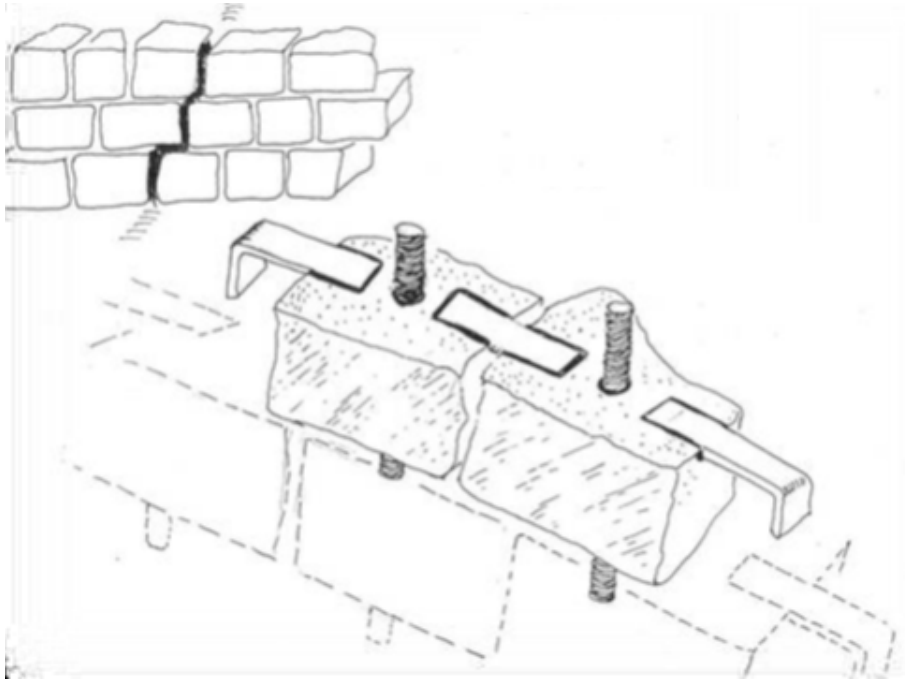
, installing unstable stones in the wall using stainless steel screws
